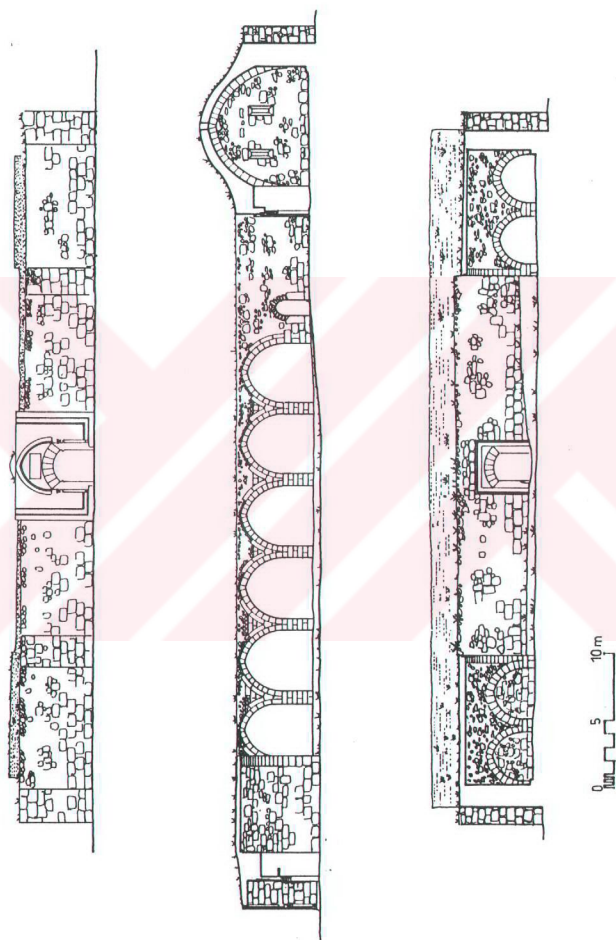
Front Façade and Sections of Kırkgöz Khan
